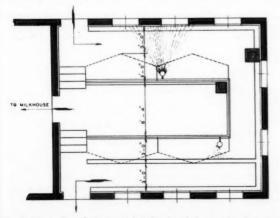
Floor plan of U-type parlor showing drainage. On the top a single gutter is used, while on the bottom two were installed. Note how much more area must be covered and water used to clean up the same amount of droppings where only one gutter was used
